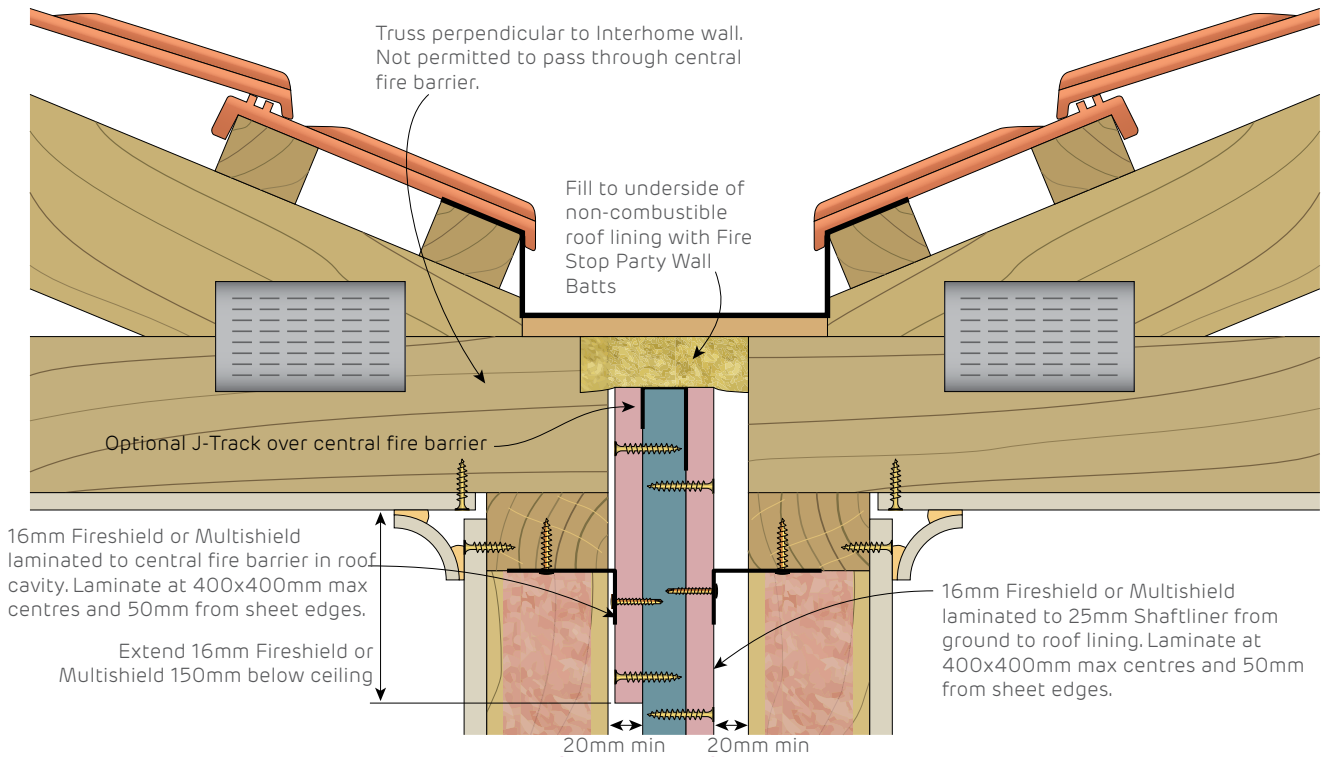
Interhome Wall to Box Gutter with Perpendicular Roof Trusses
